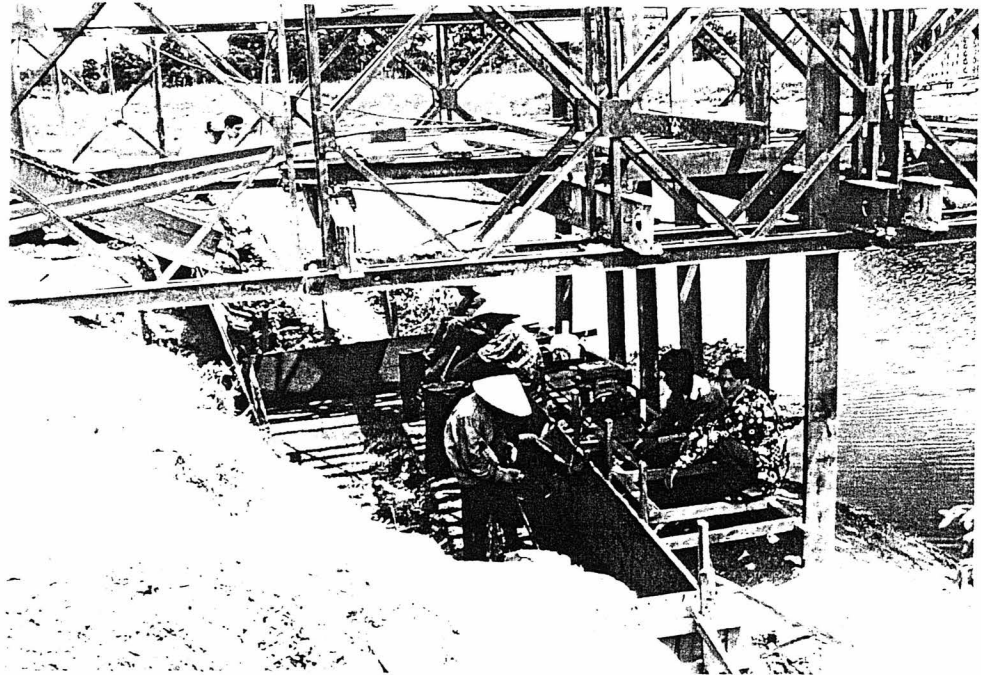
Two of the 5 road access construction works were started in June and will be completed in July. This photo is shows rehabilitation works on the Nam Souang Bridge for the Na Kaha PBP, Vientiane Prefecture.
